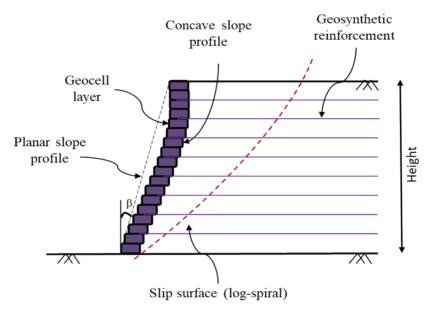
Concave Geo-Synthetic Reinforced Soil Structure with Geocell Blocks as Facial Element
